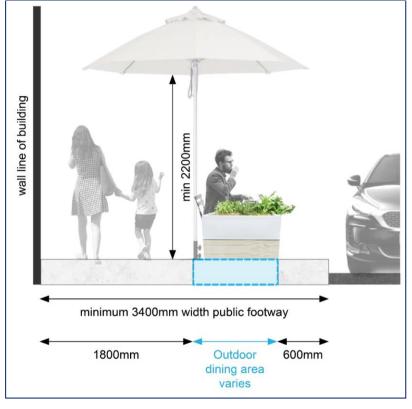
Footway to be located kerbside and to provide a clear path of travel
